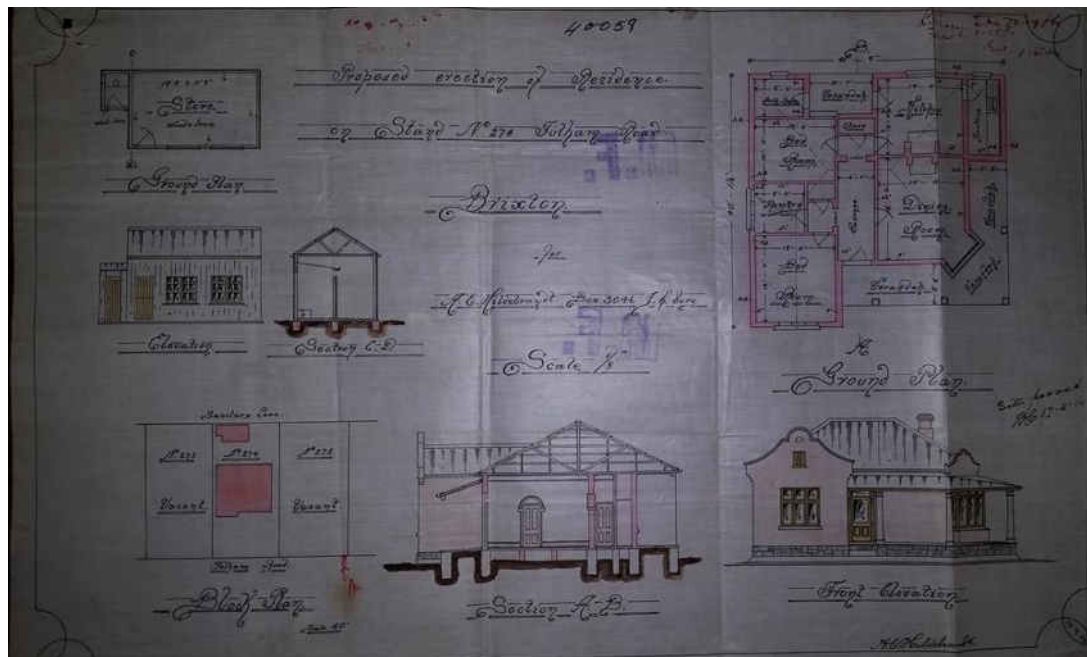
Proposed erection of residence, plan shows site and floor plan, sections and elevations for Stand 274 from 1914
